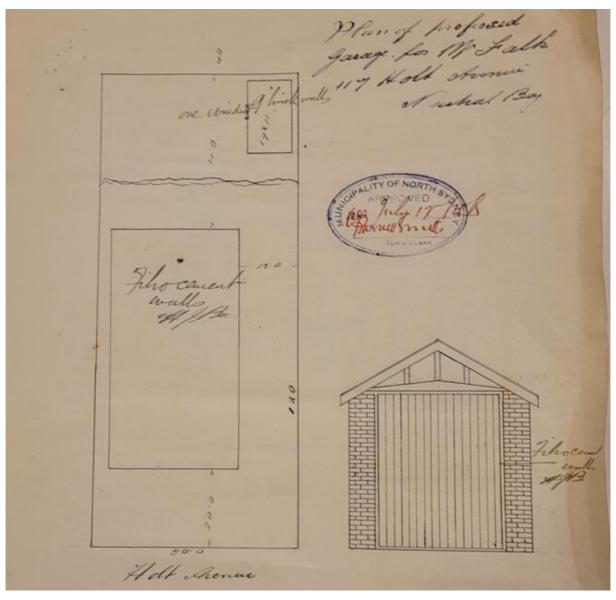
Plan of proposed garage for Mr Falk, 117 Holt Avenue, Neutral Bay, June 1918. (Source: NSMCA 91/5/? Folder F, 1918)
